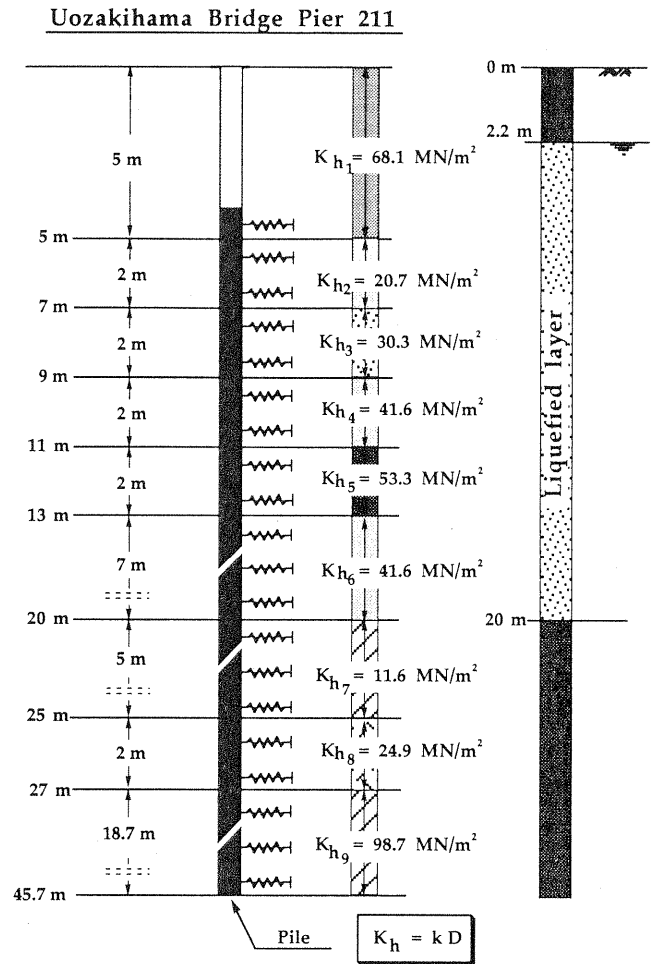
Soil stiffness properties for the cast-in-place RC pile at the Bridge Pier 211 in Uozakihamama Island
